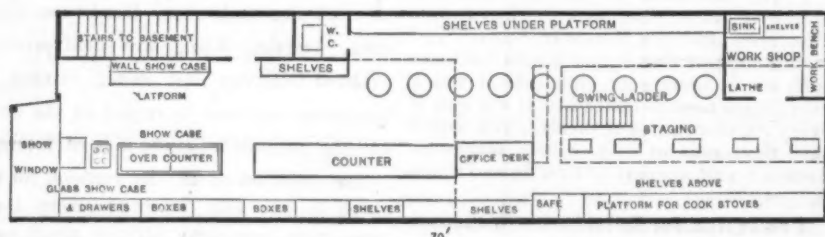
Ground Plan of Schiller House-Furnishing Co.'s Store.
